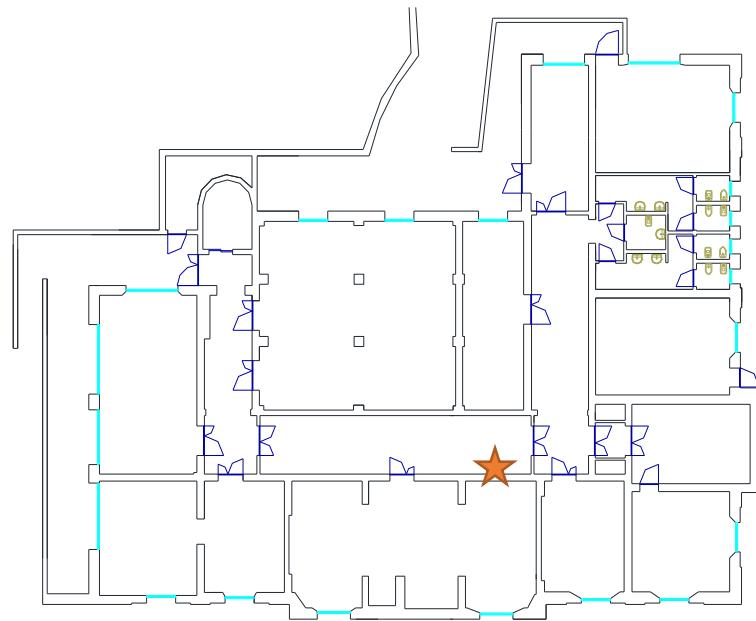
/a: The basement level plan with position of in situ investigation tests (L_P-1_01).
